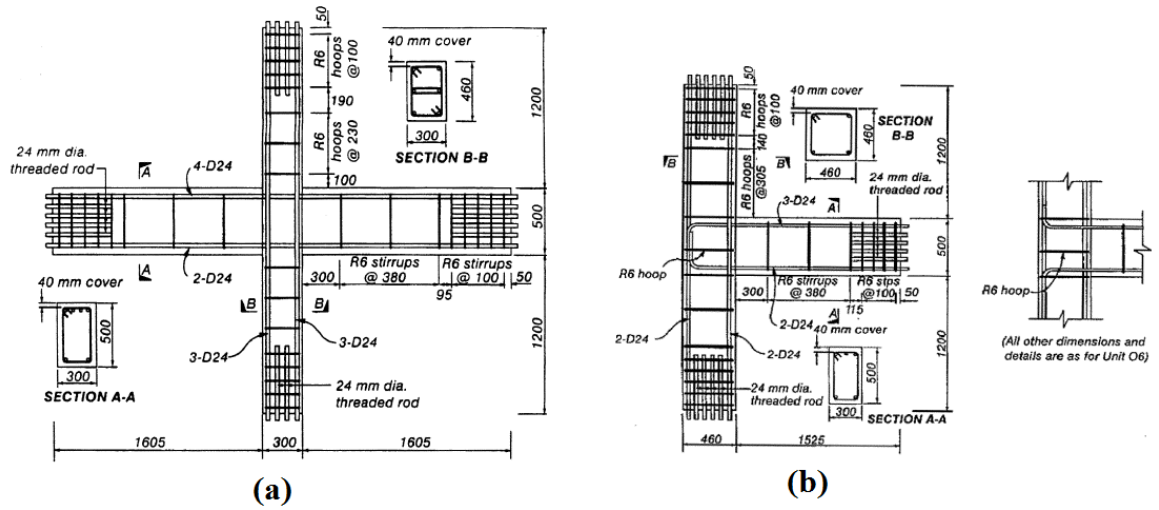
Interior and Exterior Beam Column Joints Size and Reinforcement Detailing [1]
